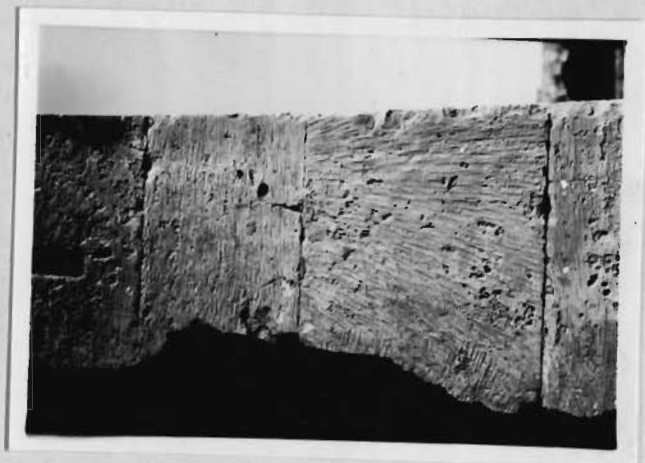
and 23 showing straight edge dressed stones of crusaders peroid.
